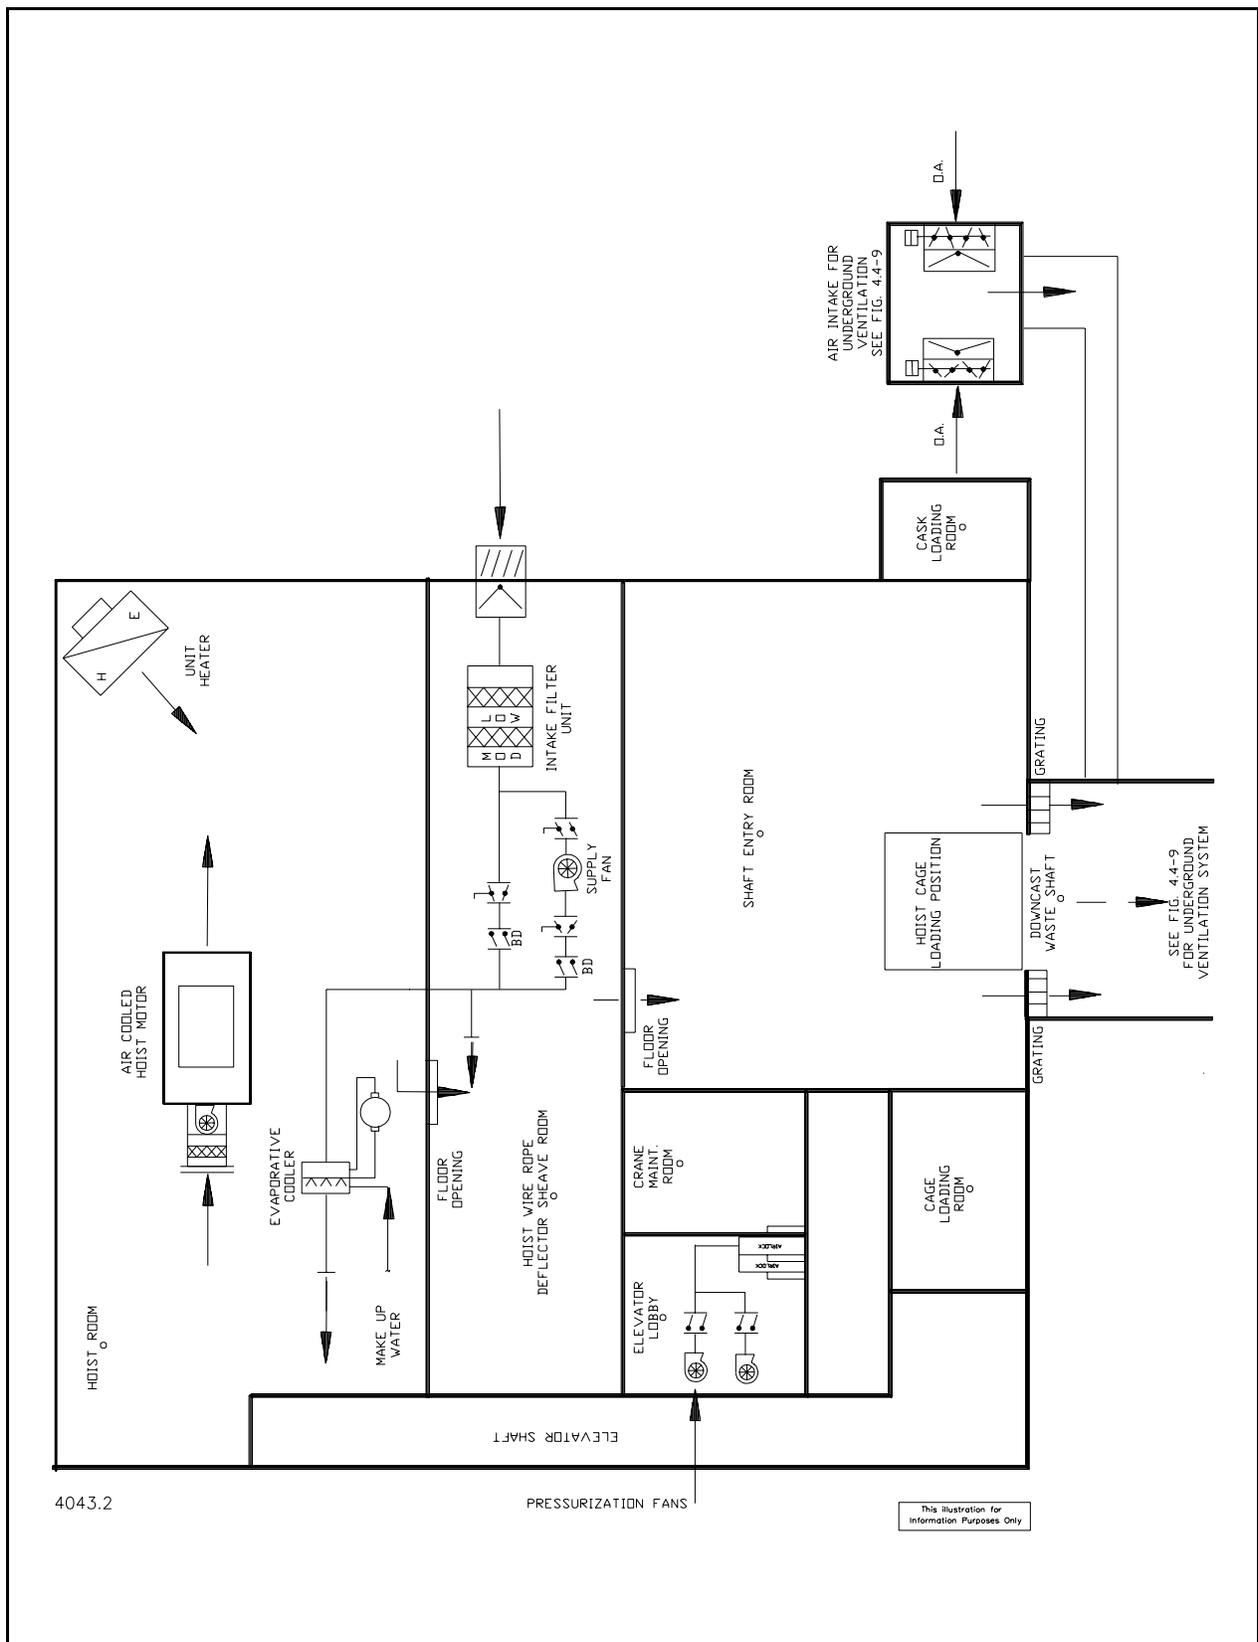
, Waste Handling Shaft/Hoist Tower HVAC System Flow Diagram
